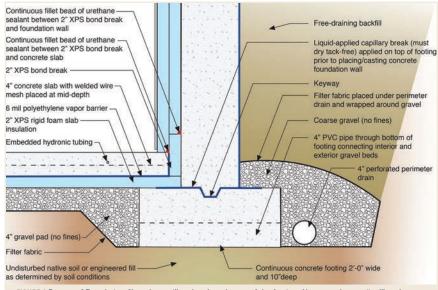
Bottom of Foundation. Note the capillary break at the top of the footing. Also, note the two "red" sealant beads. They are absolutely necessary to create an airtight seal between the basement slab and the interior of the perimeter concrete foundation wall. Also note the filter fabric under the gravel pad. Not standard, but a really good idea.
